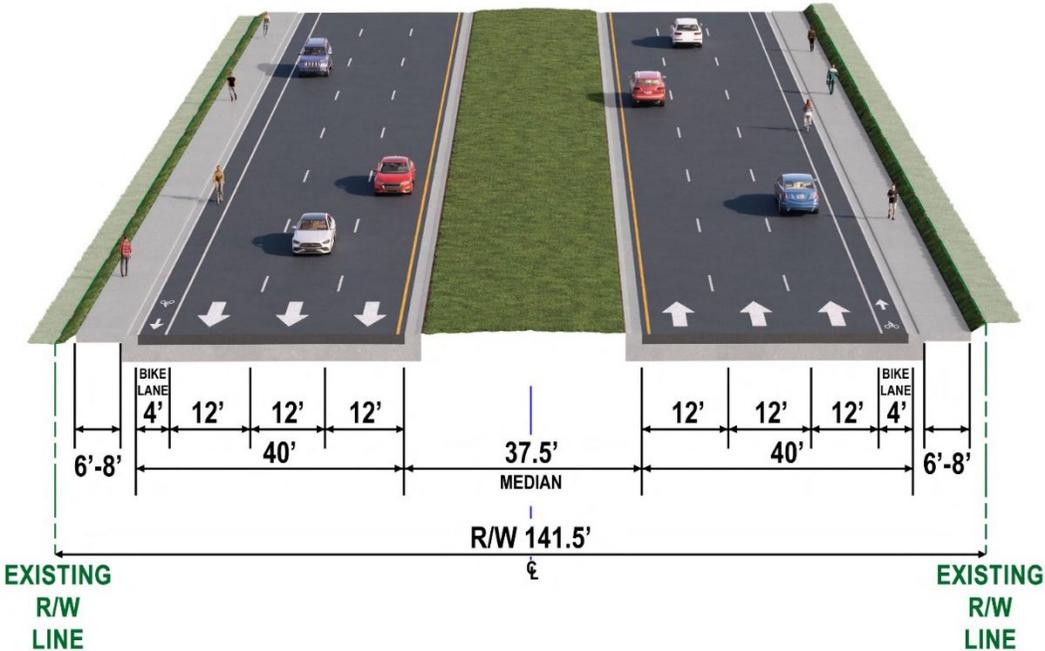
Existing Typical Section - SR 54 East and West of US 41 (Near Intersection)
